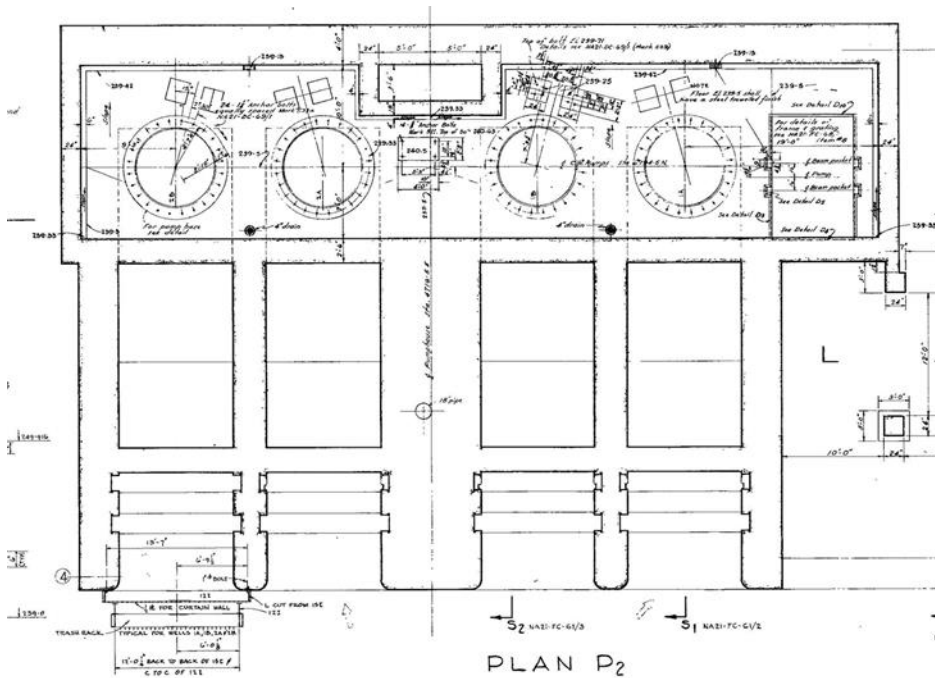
Plan view of Pumphouse 1 (Units 1 and 2) from historical drawing (NA21-EC-61-7 CW)
